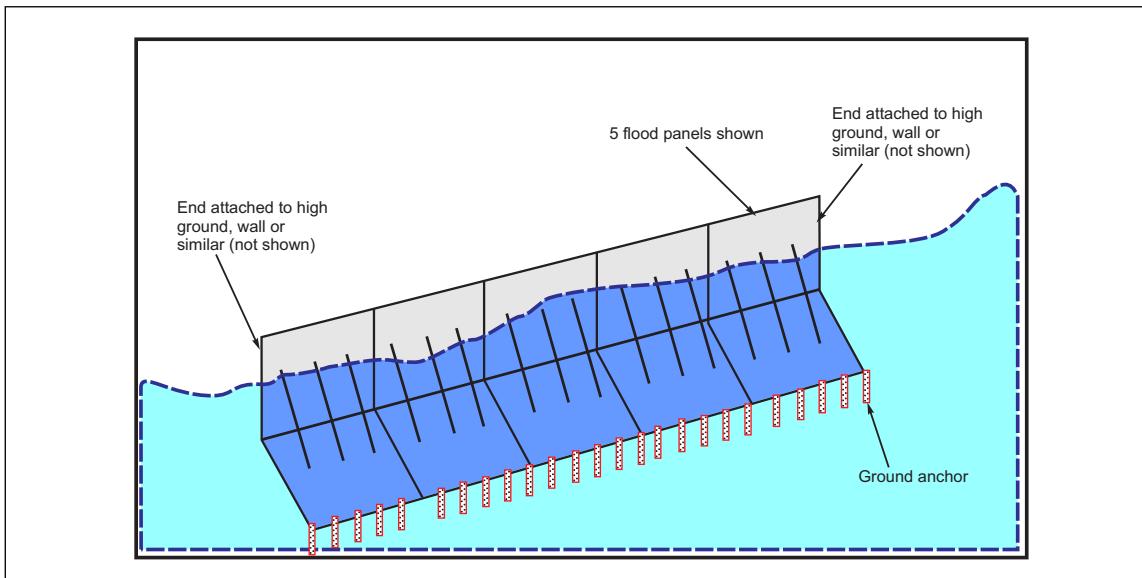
Deployable flood walls without foundations
